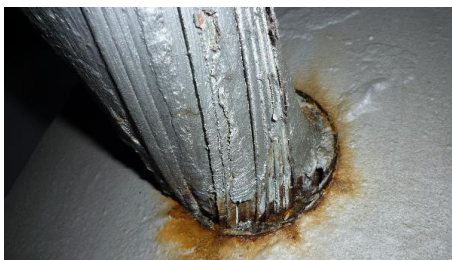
Corroded lock coil strand used to make up a complete stay cable
